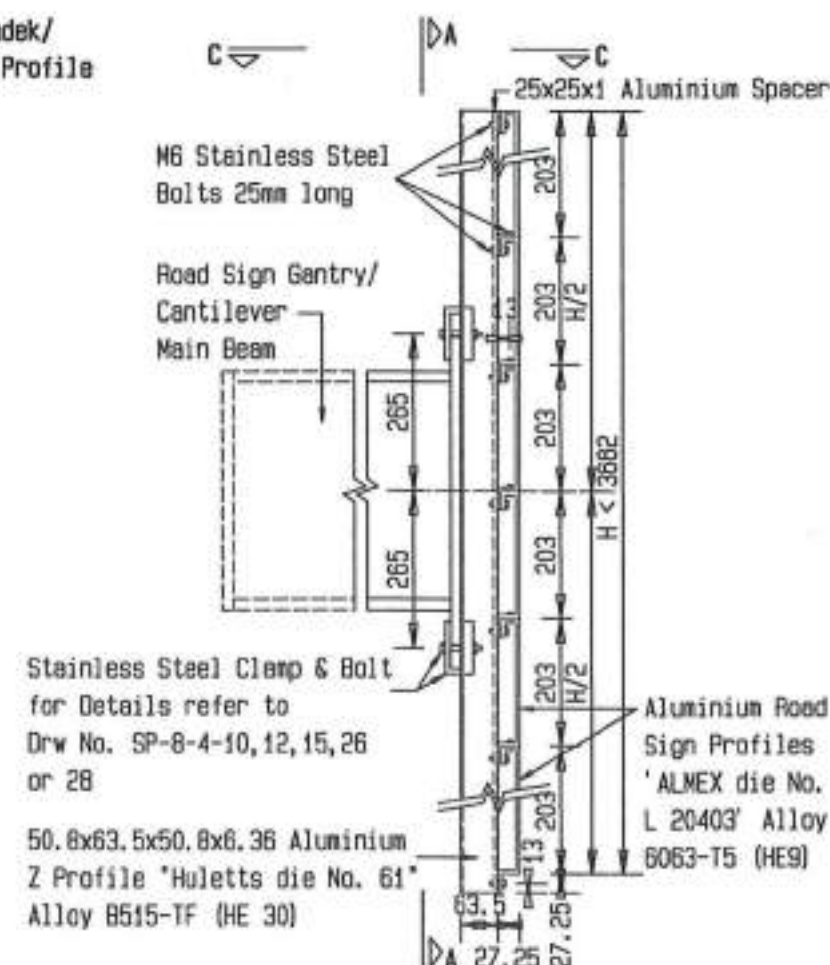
Overhead Mounted Road Sign Back Plate consisting of Stacked Aluminium Alloy Road Sign Profiles
